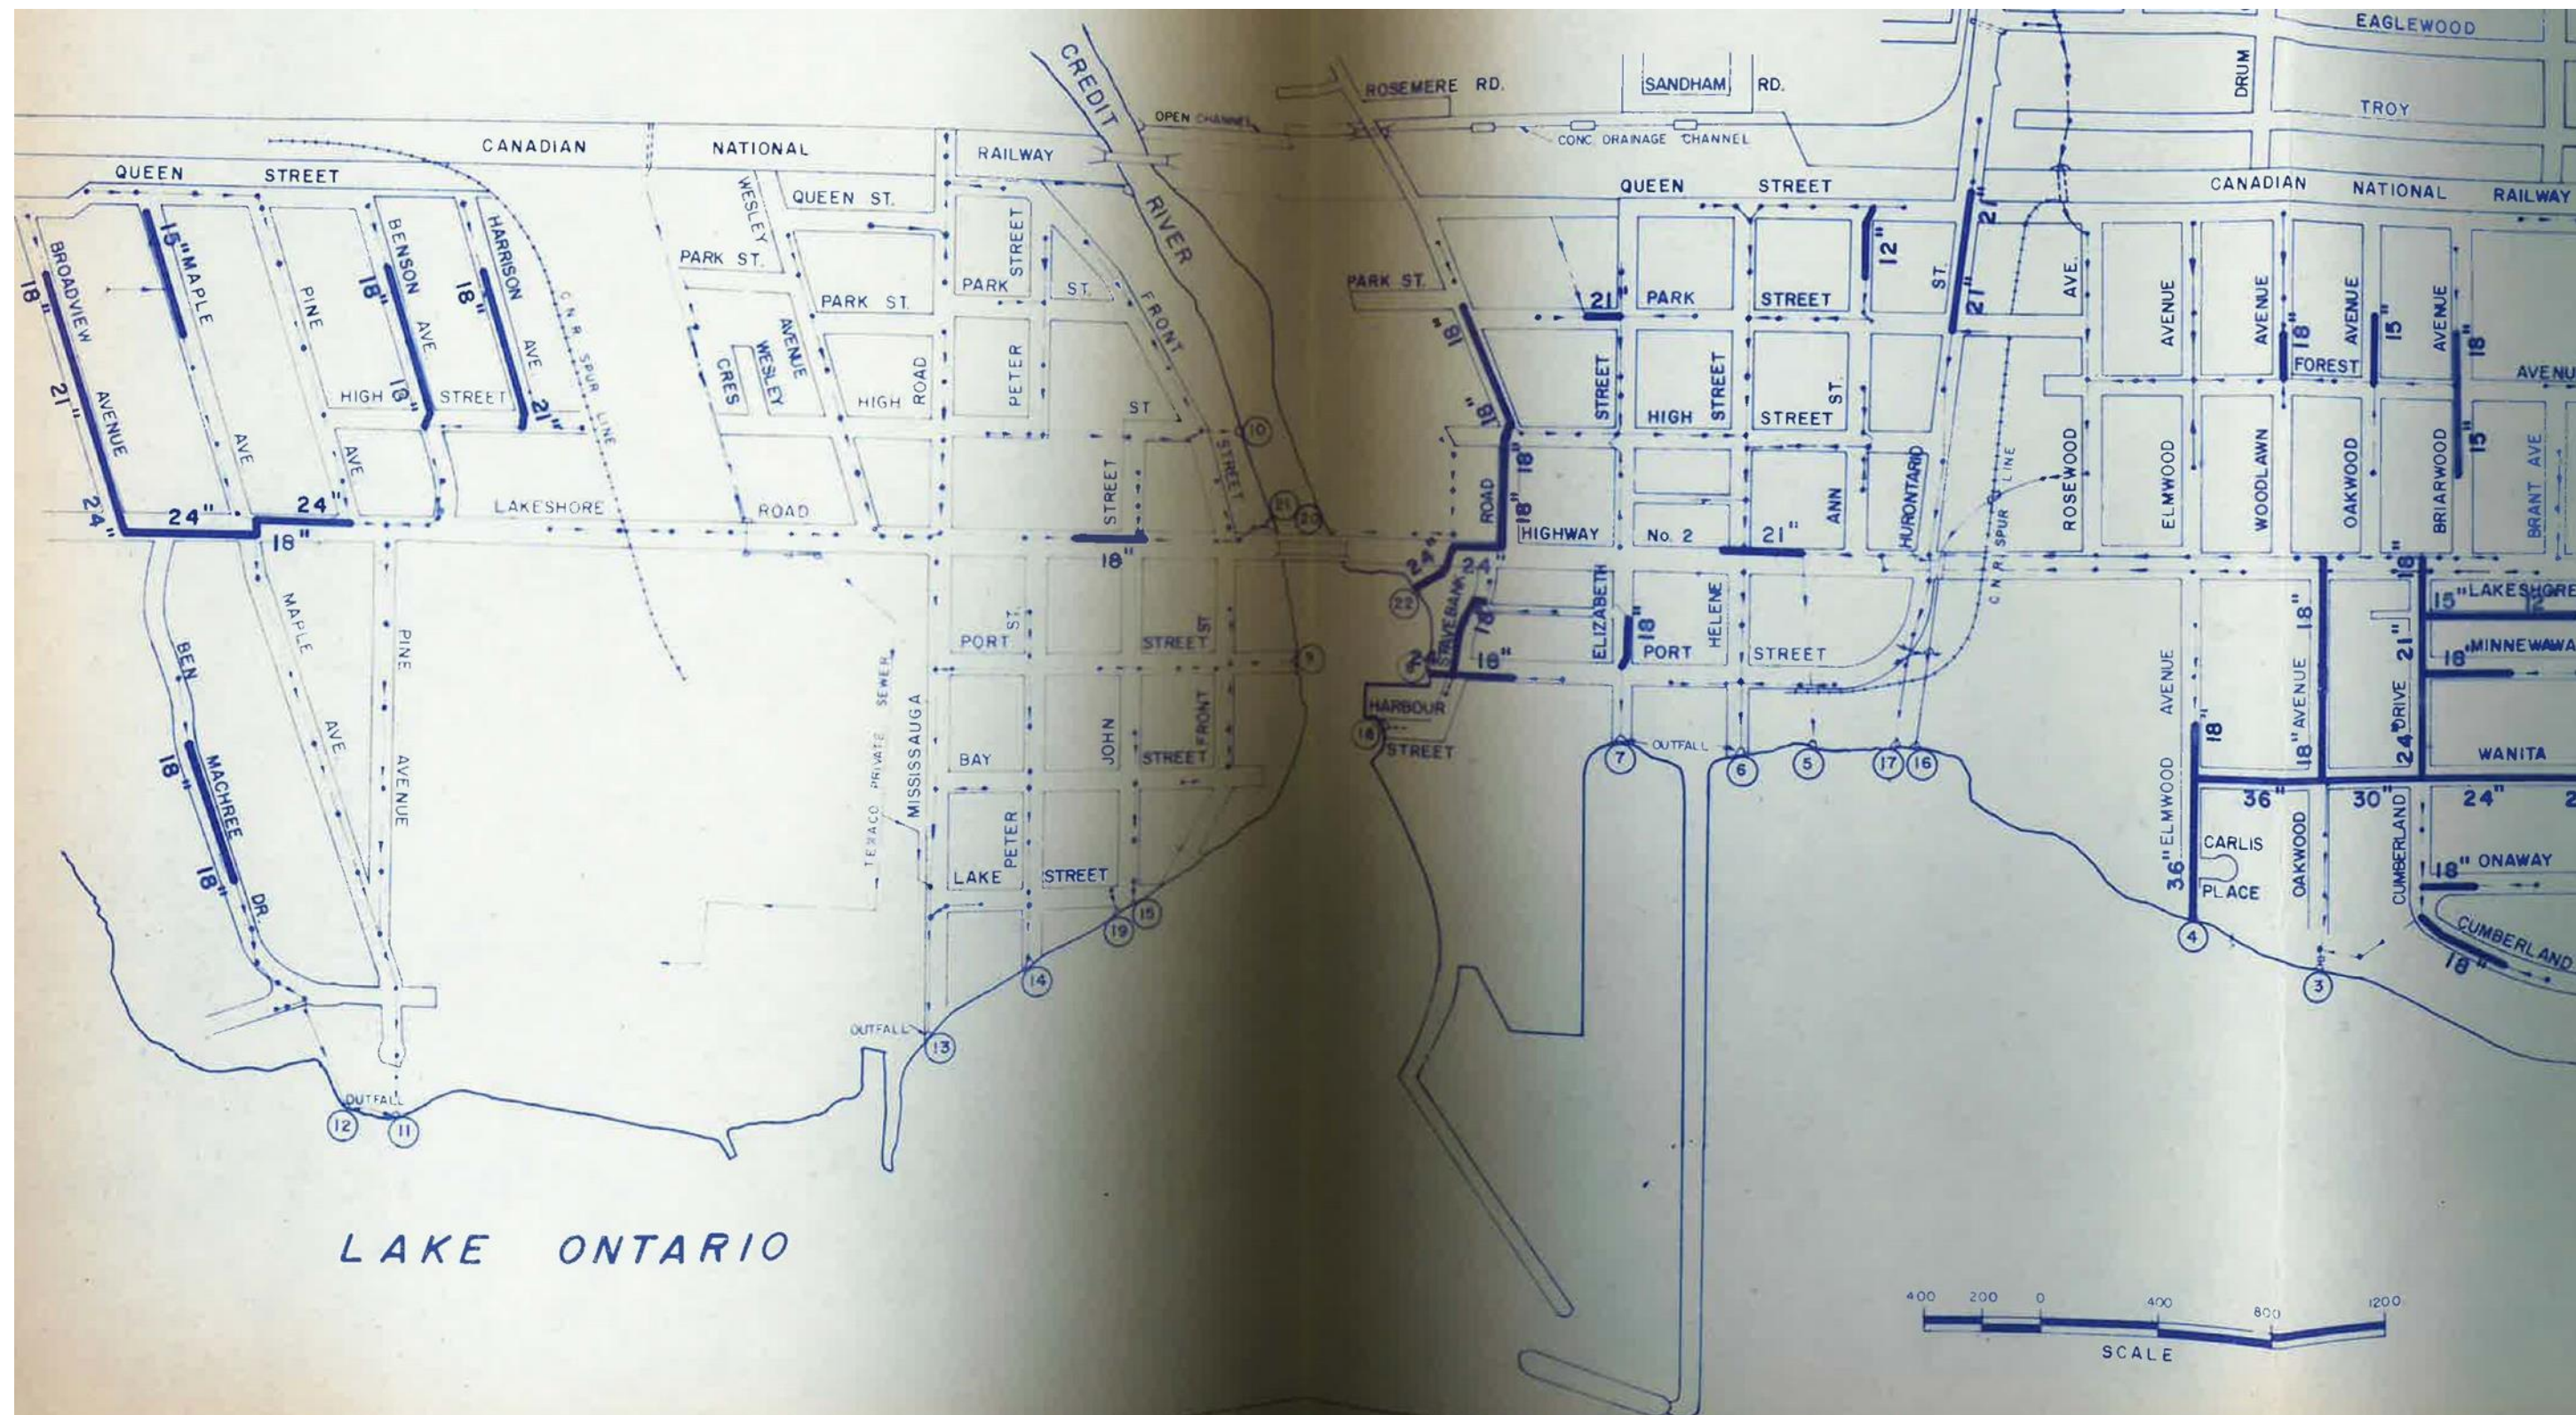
Proposed Relief Sewers (James F. MacLaren, 1975)
